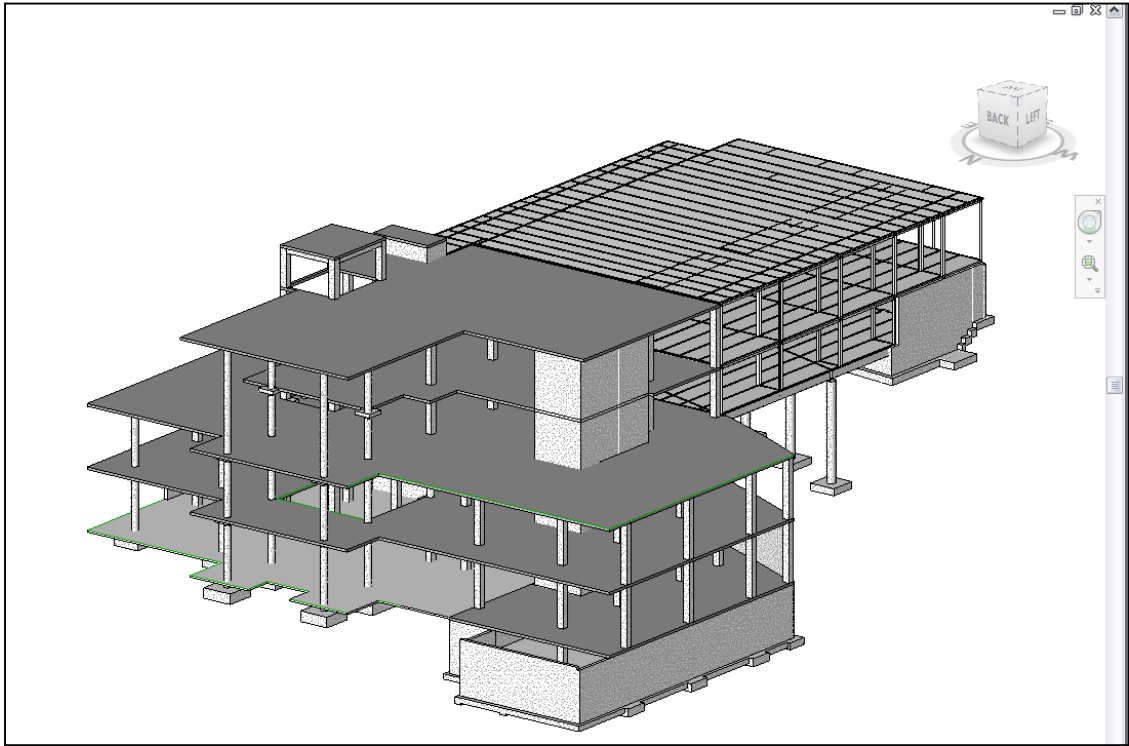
A bird's eye view of the concrete slabs and roof, and of the steel joists and metal decking.
